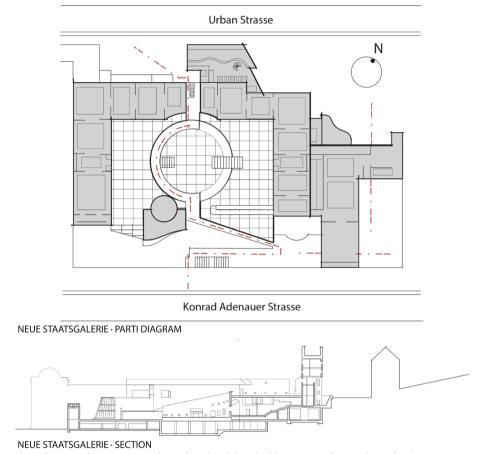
Neue Staatsgalerie, Stuttgart, Germany, 1984. Above: Site plan. Below: building section (Source: the authors)
